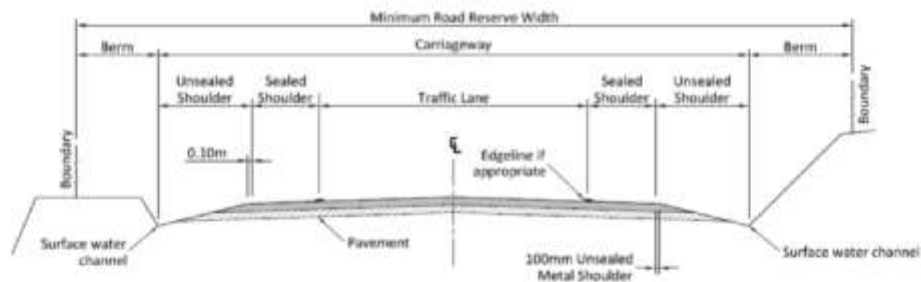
Typical Cross Section for Sealed Rural Roads – Engineering Code of Practice 2011
